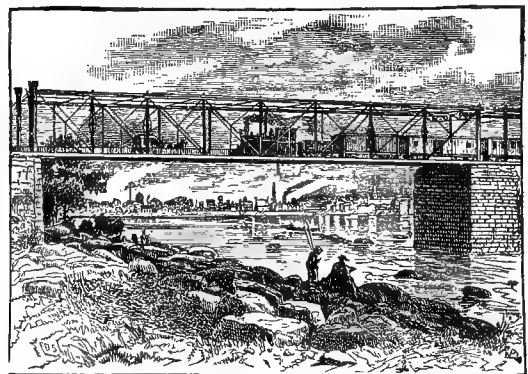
Railroad and Highway Bridge at Trenton, N. J., on Pennsylvania R. R.
